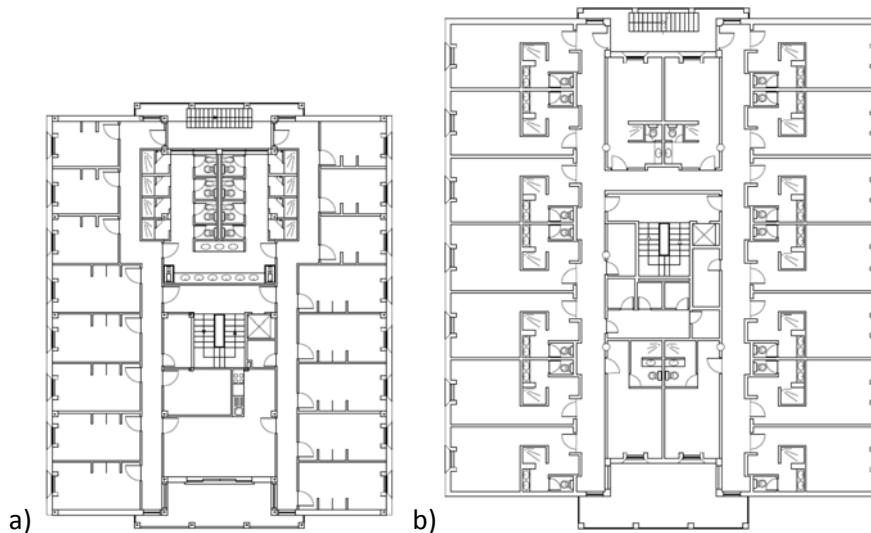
Floor design of students' residence buildings in the same scale; a) "Building G1" using some community buildings features; b) "Building G2" using a conventional design.
